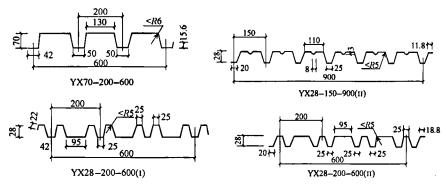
Models of Profiled Steel Sheet for Building and Decoration
